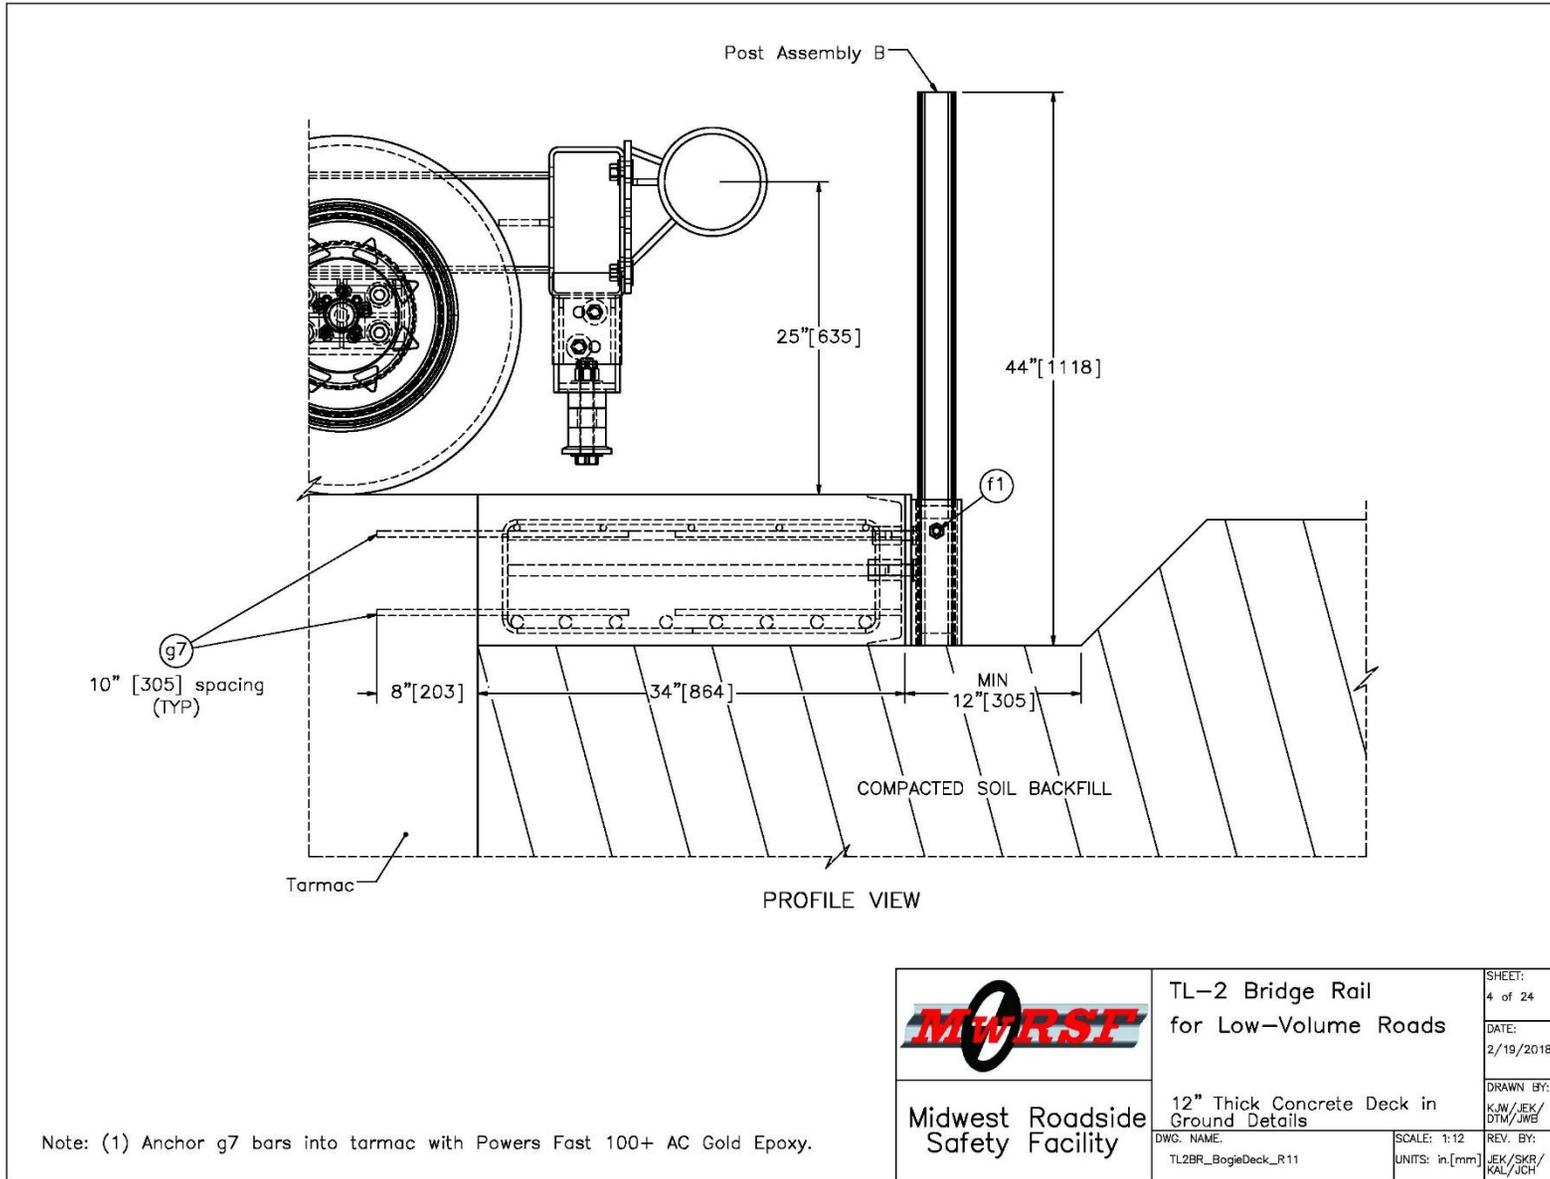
Bogie Testing Matrix and Setup, 12-in. Thick Concrete Deck in Ground Details
